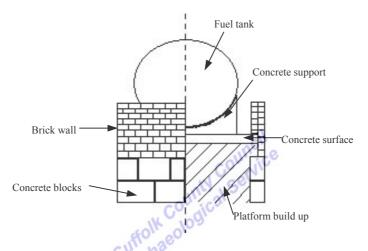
Reconstruction sketch of fuel tank and concrete surface
